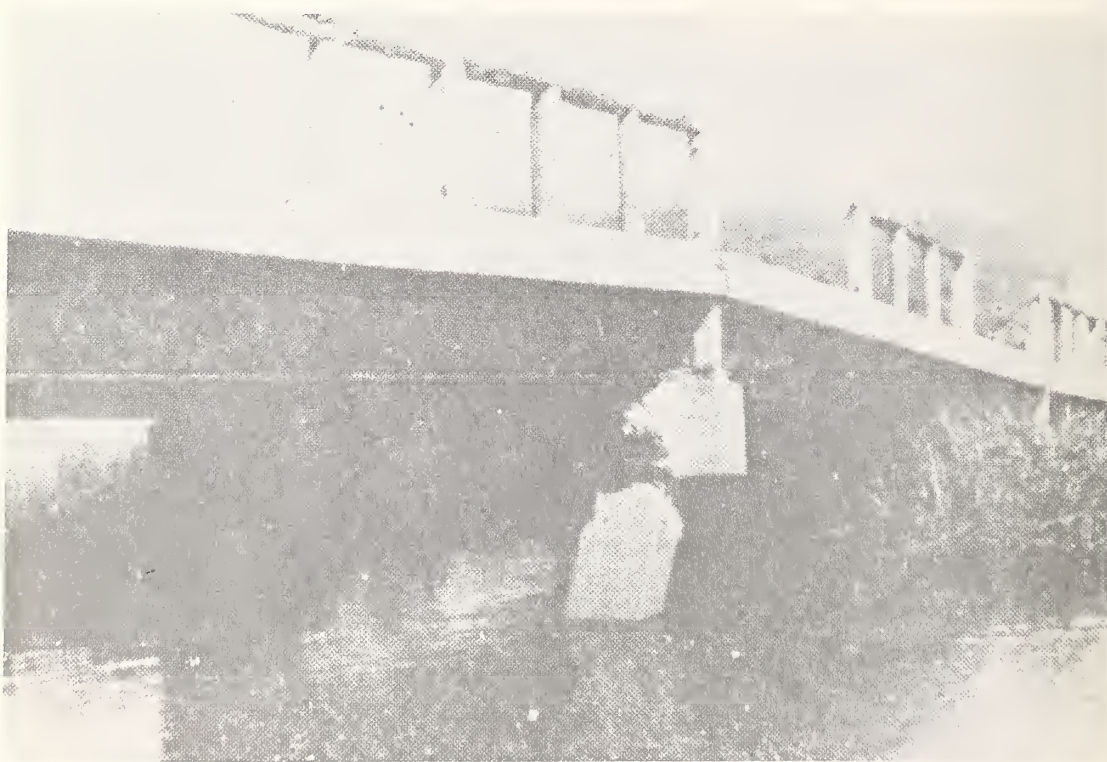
Damage to the piers of the Nagaya bridge
